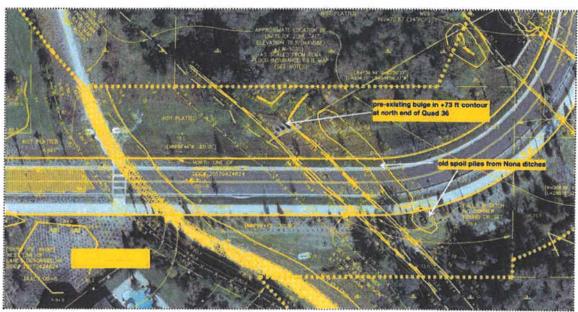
Pre-construction topo at Quad 36, note channel instability on north
